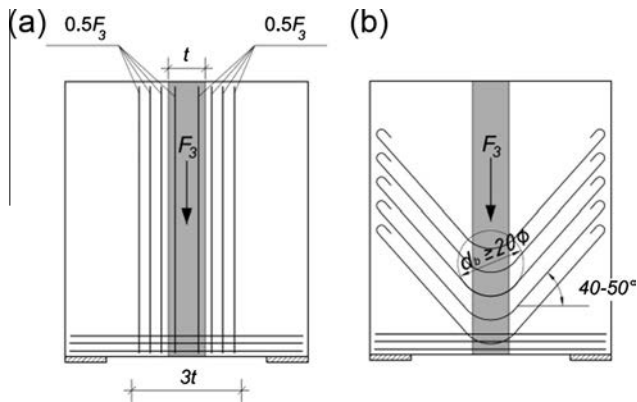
Reinforcement in the transversal deep beam related to: (a) vertical stirrups [16]; and (b) bent up bars [14].
